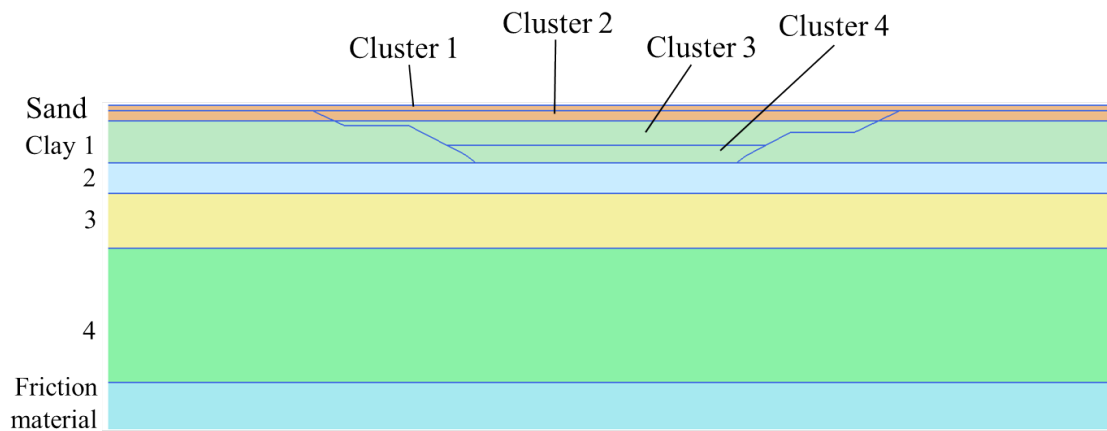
Excavation 2 – section B, with the four soil clusters pointed out.
